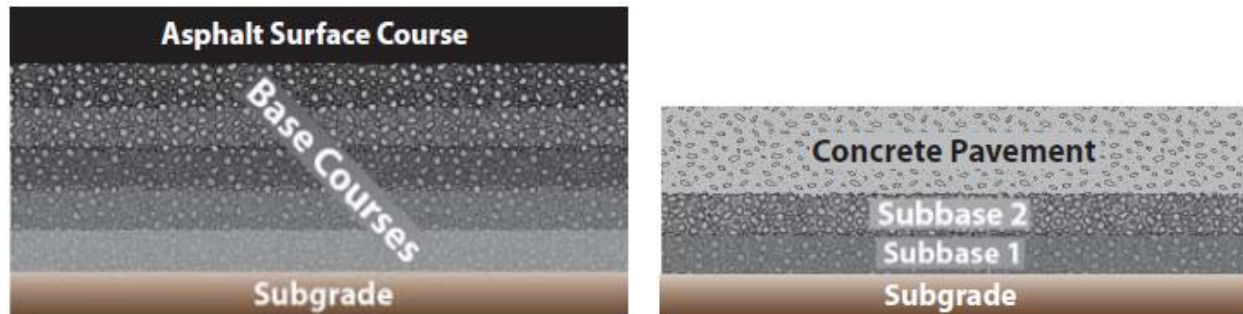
Terminology used in flexible (asphalt) and rigid (concrete) pavements.
